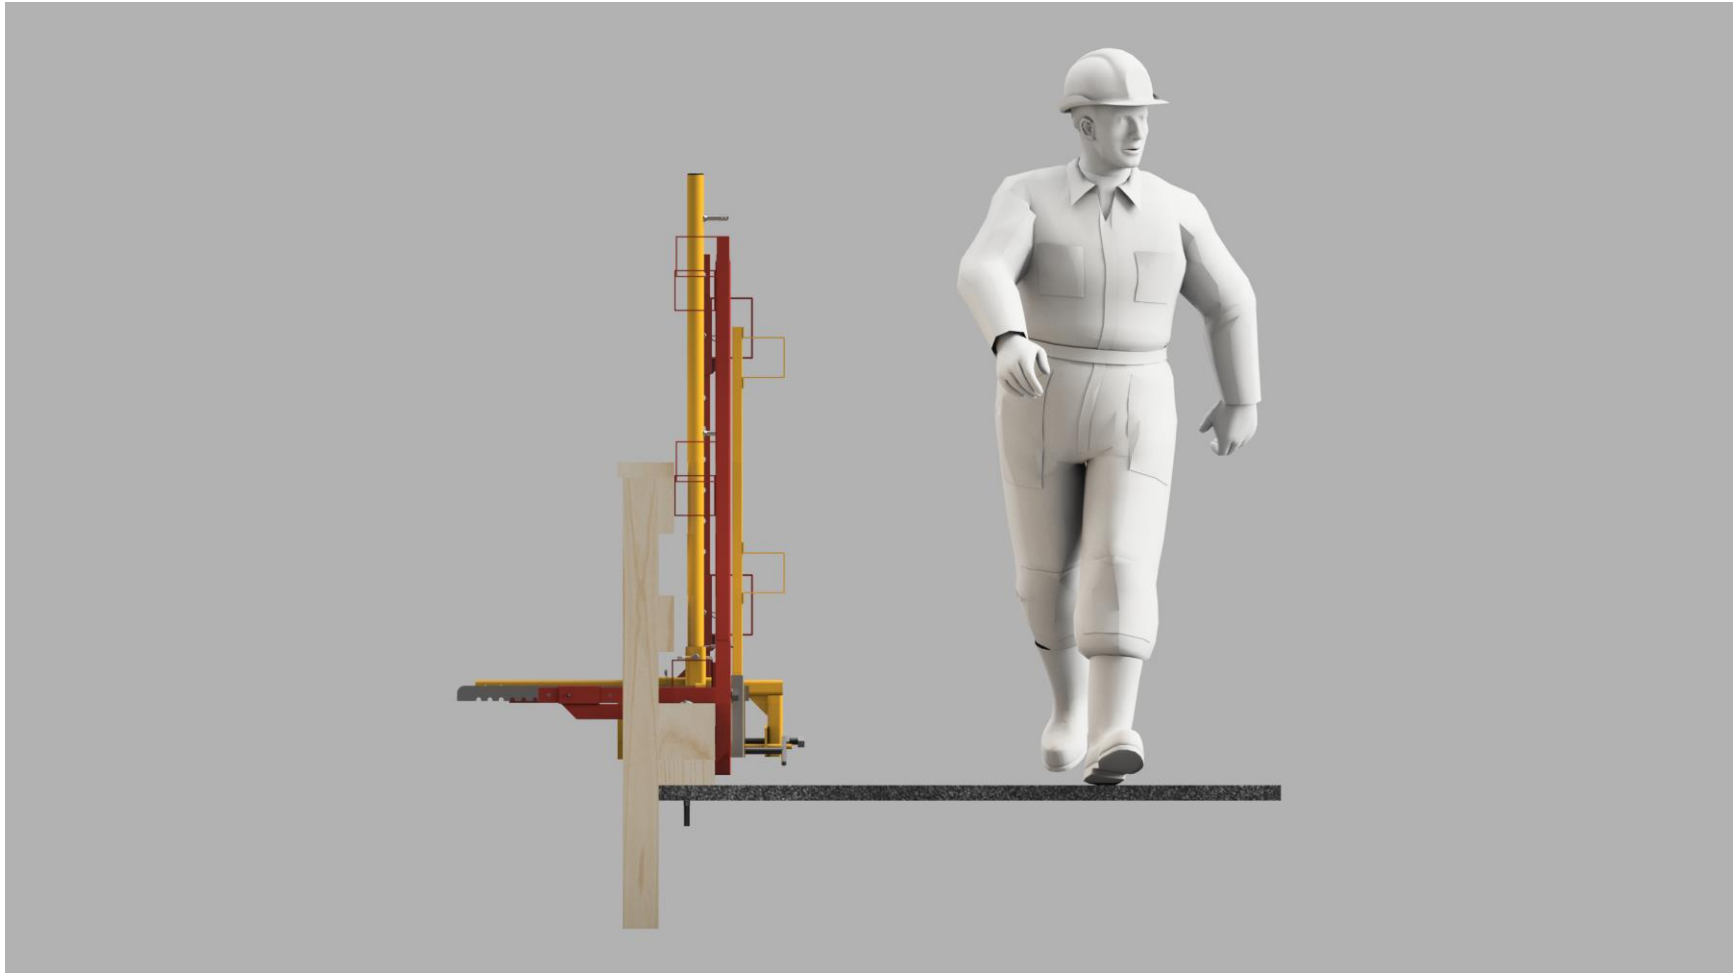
Guardrail Type 22, wheel guard fit; view from the south
